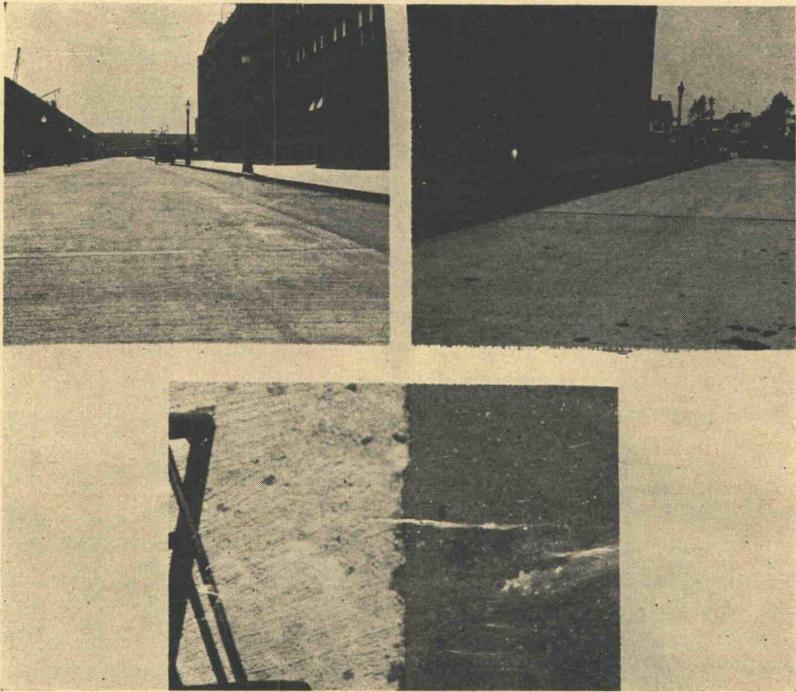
Two Types of Pavement, Asphalt and Concrete. Upper Left Facing Sun; Upper Right Facing Away from Sun. Lower Middle Looking Directly Down on the Two Pavements
